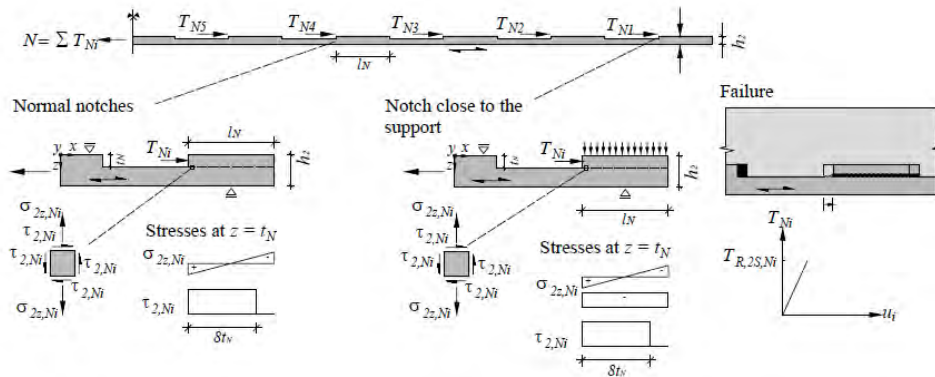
Cantilever model by Boccadoro for the prediction of Timber Shearing-off Failure (TSF) in the notch for traditional TCC floors with a 'thick' cracked concrete slab [4].
